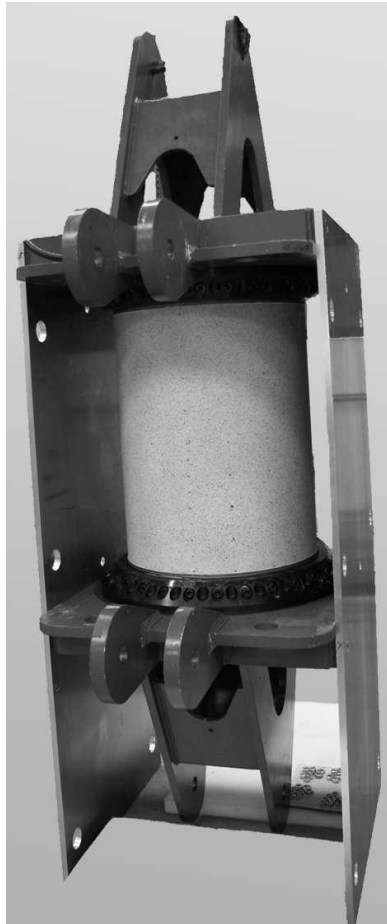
Cylinder layout before application of the speckle pattern
